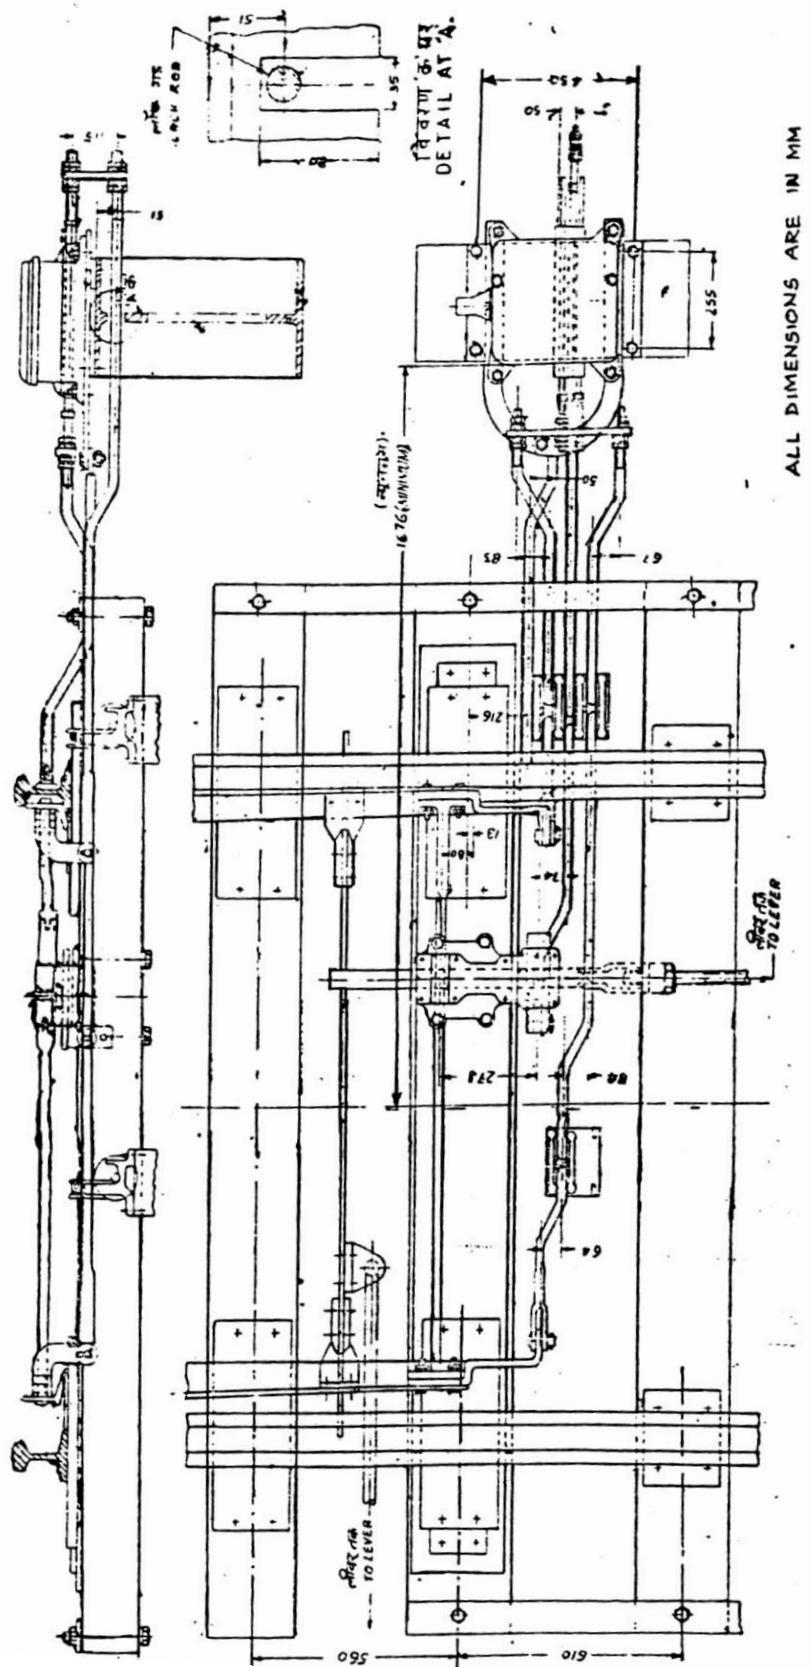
FIXING ARRANGEMENT OF ELECTRIC FACING POINT AND LOCK DETECTOR ON INDEPENDENT FOUNDATION (LAYOUT FOR 75R OR 1 IN 12 TURNOUT BG)
